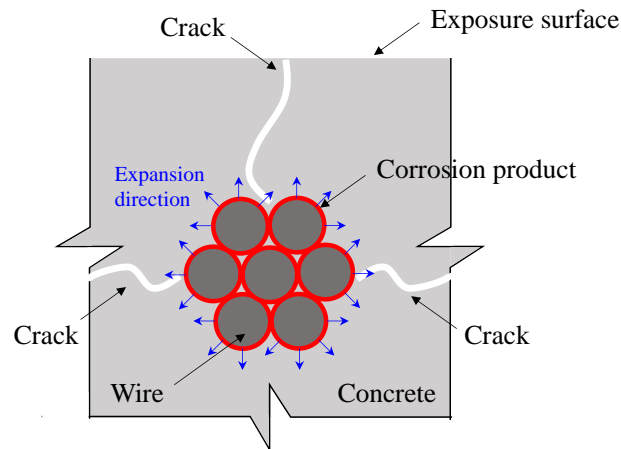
Cracking in concrete due to volumetric expansion of corrosive products.
